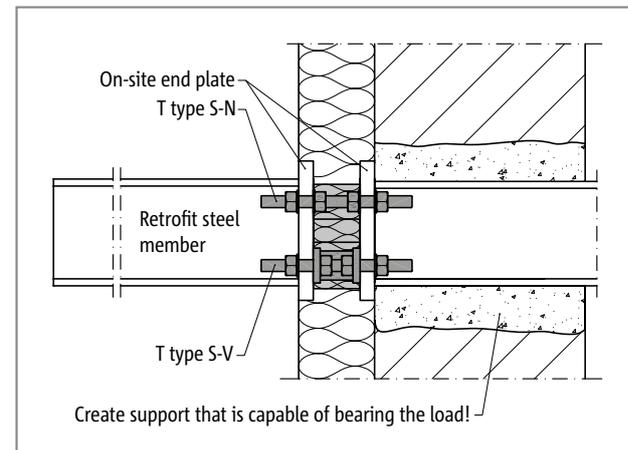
Schöck Isokorb® T type S-N and T type S-V: for retrofitted cantilevered steel structure; for further renovations examples see p. 96
